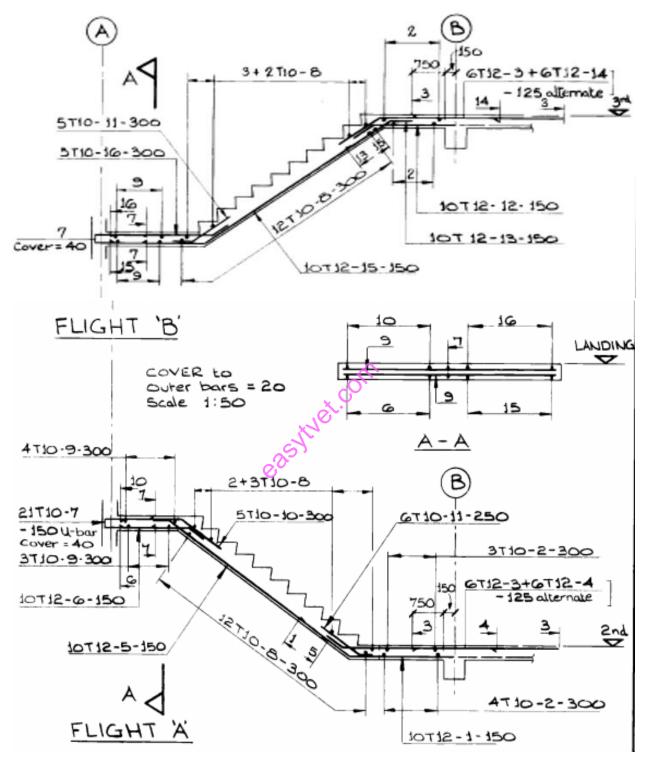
Reinforcement details of an end-span continuous slab (staircase) with 20mm nominal cover
